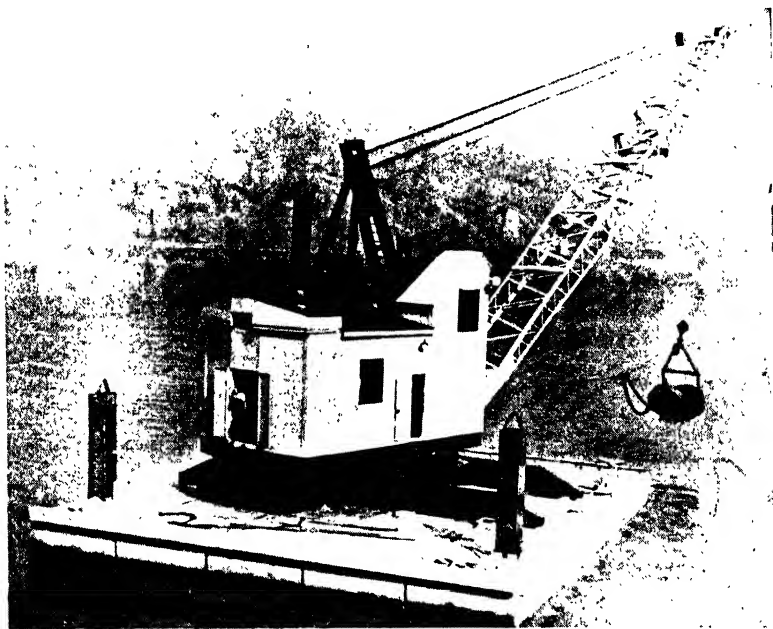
Whirler crane mounted on pontoon type of hull for river dredging. Hull is sectionalized to fit railroad cars.
